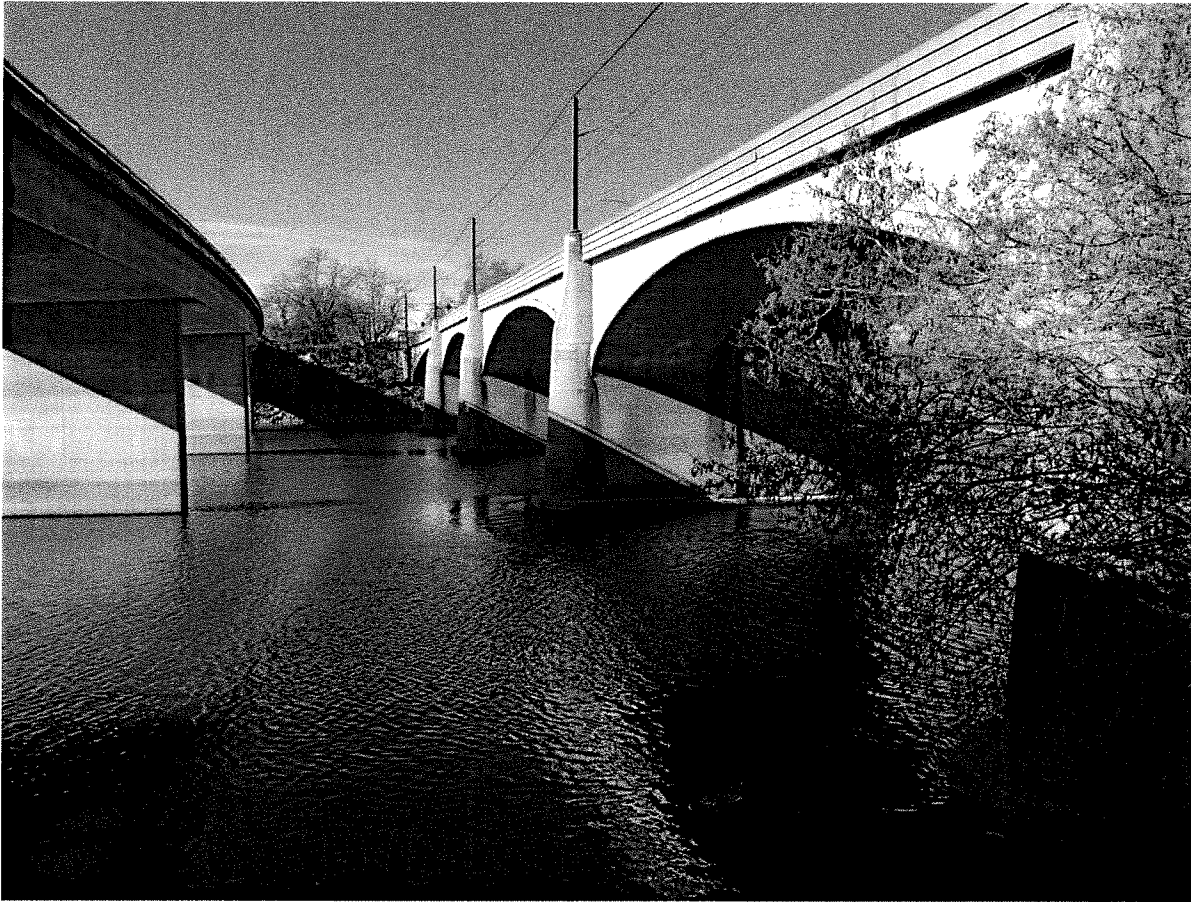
1 - View of the 12th Street Bridge (right) and the 16th Street Bridge (left) along State Route 160 across the American River. This view is looking south-west. In this view Abutment 1 (south bank) can be seen, as well as Piers 2, 3, 4, and 5. Abutment 6 (north bank) is not shown. A federal levee exists along the south bank but not along the north bank.
